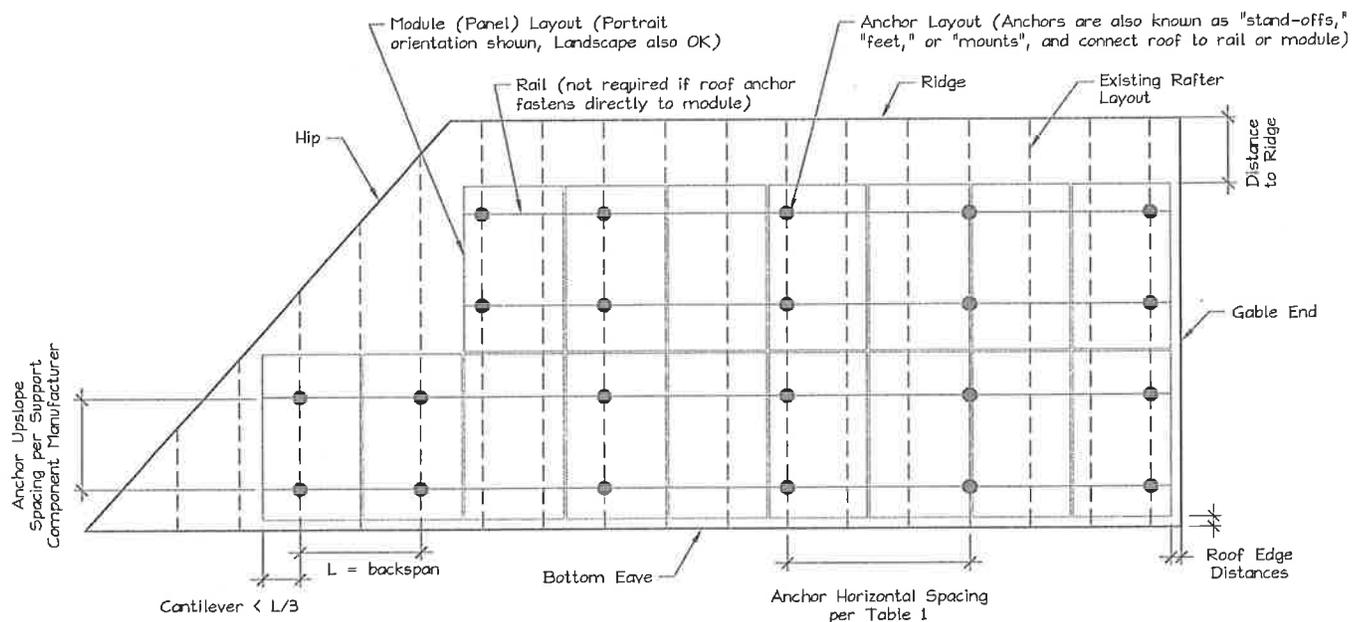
Sample Solar Panel Array and Anchor Layout Diagram (Roof Plan).
